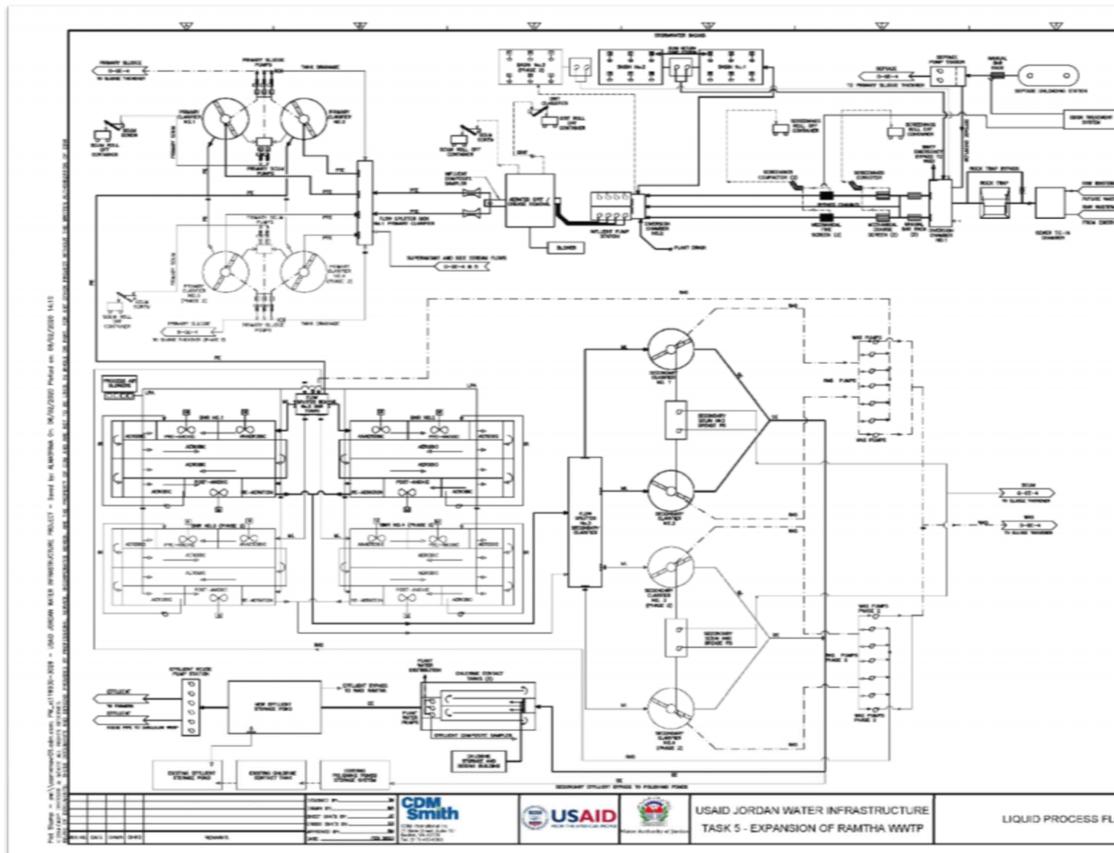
New Expansion Layout (Alternative C1- Phase 1)
